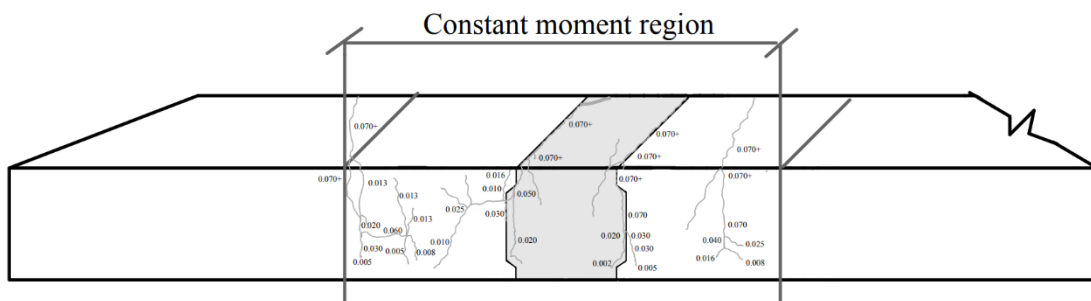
Crack Propagation for Non-Proprietary Long-Term Specimen at Failure
